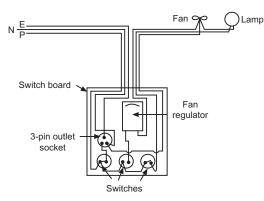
Switch board to control one lamp, one tube and on fan with regulator
